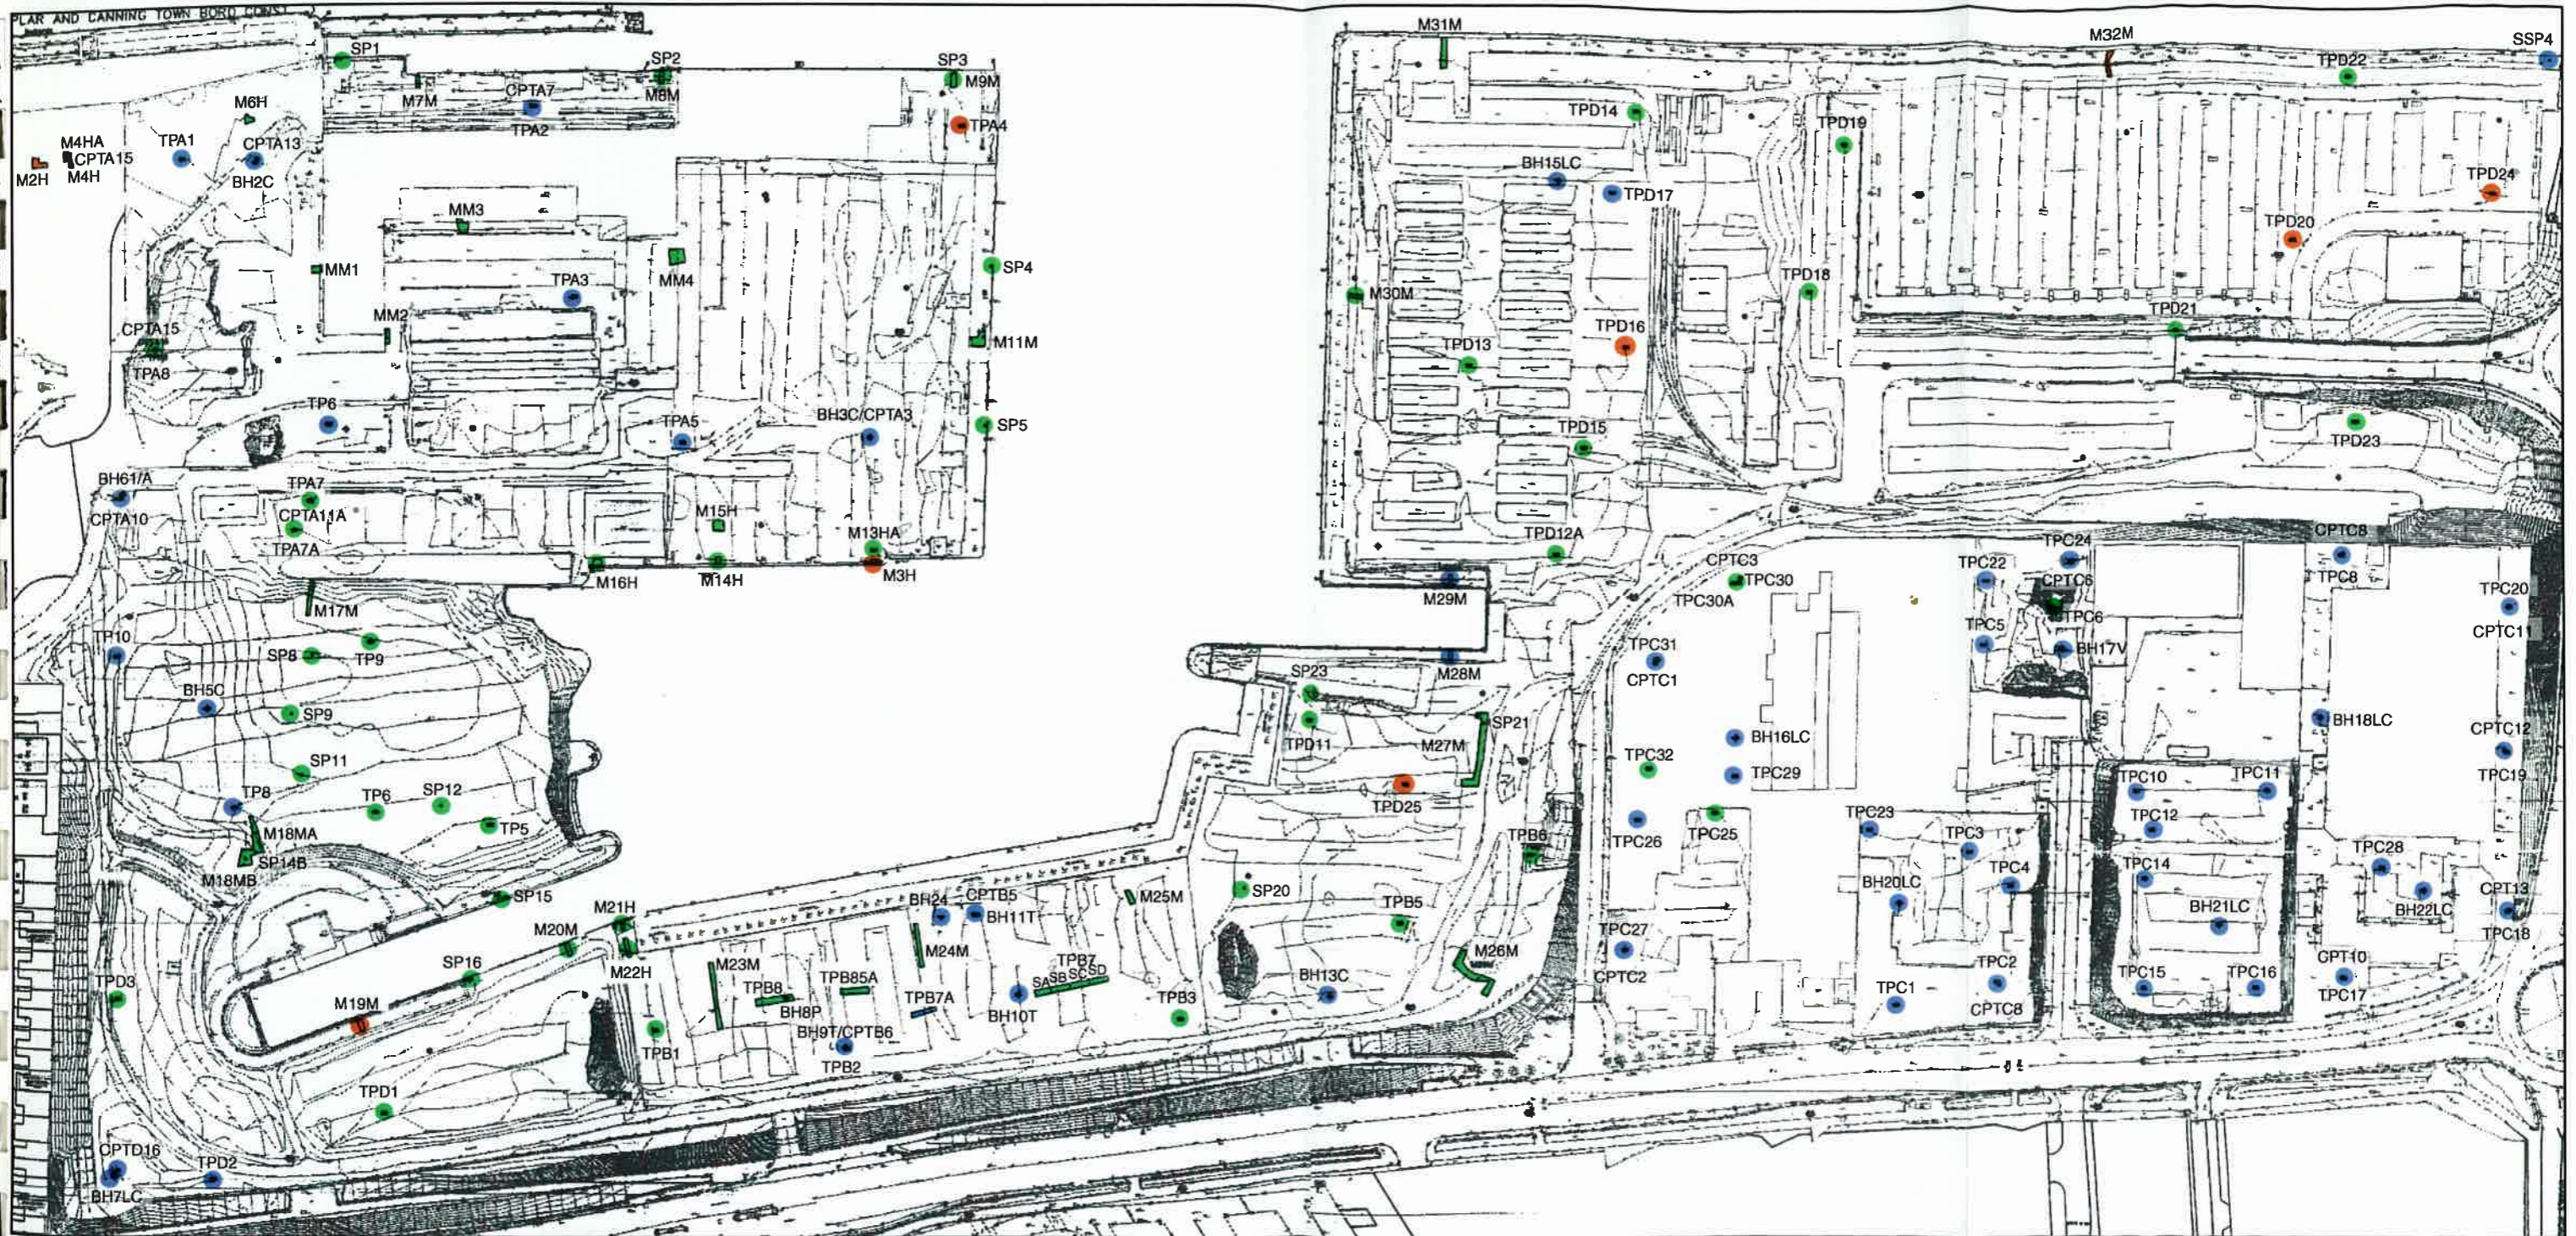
Plan of geotechnical test pit locations with stratigraphic types
